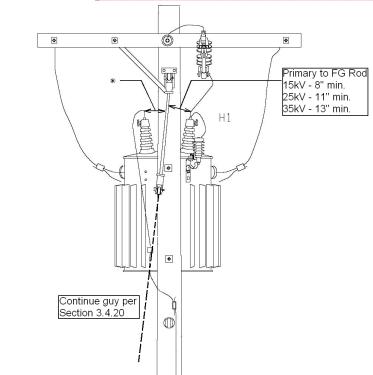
Guy Wire Clearances (Using Table 8 Clearances)
